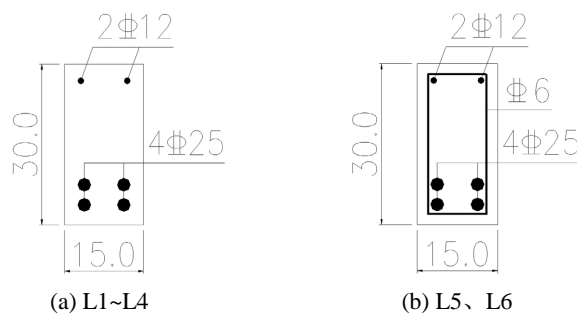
Section size and reinforcement of UHPC test beam (cm)
